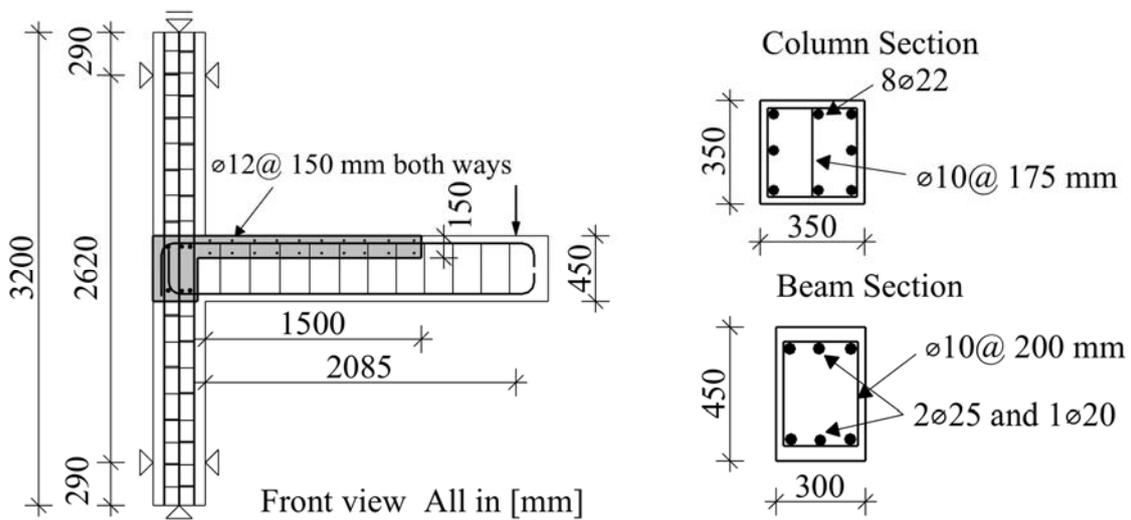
Geometry and reinforcement detailing of the investigated beam-column joints
